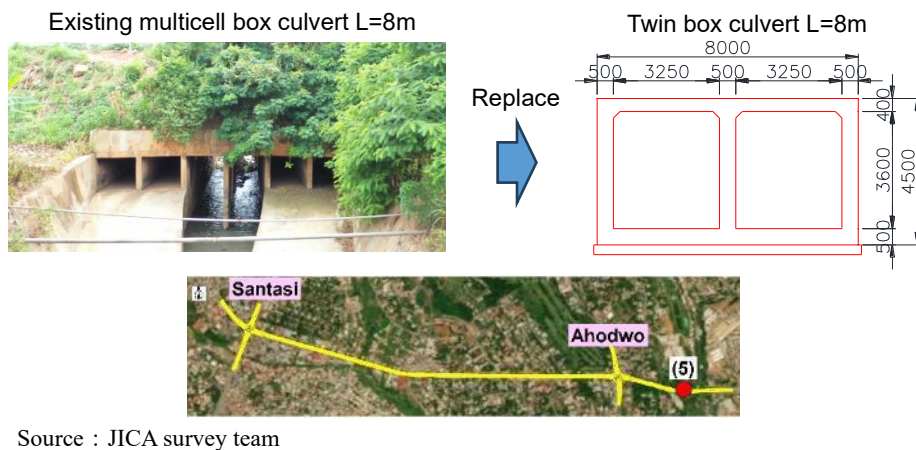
Structure (5): Twin Box Culvert L=8m
